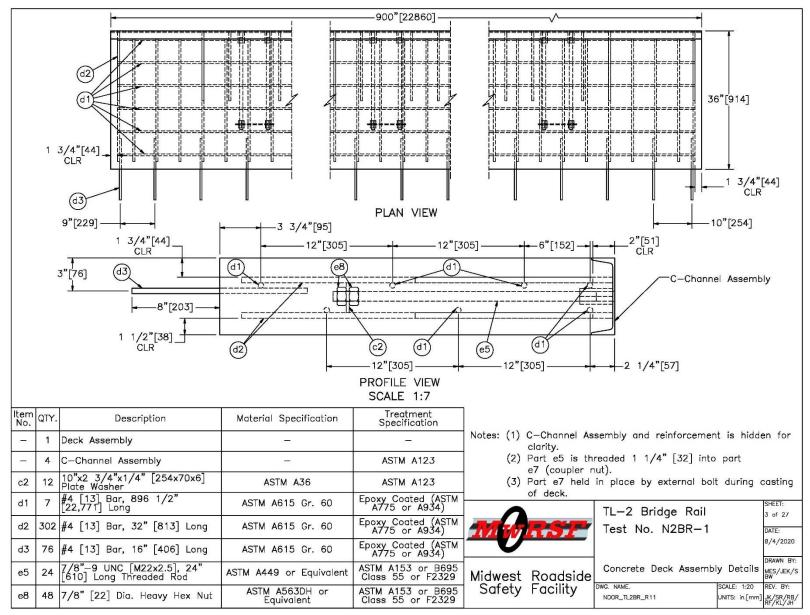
Concrete Deck Assembly Details, Test No. N2BR-1
